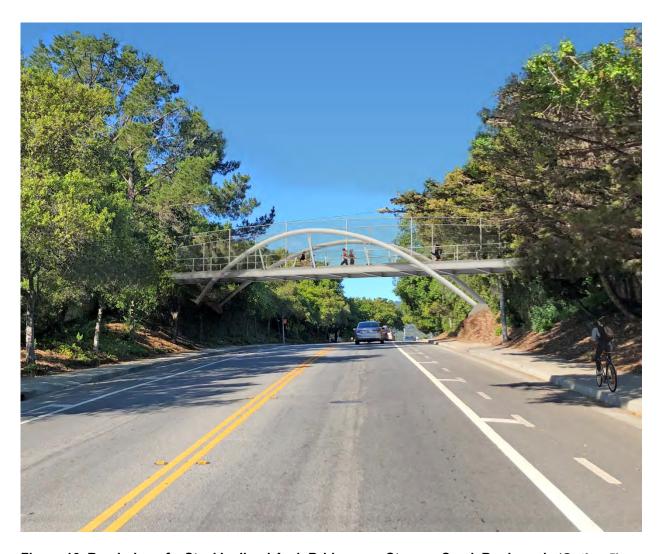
Rendering of a Steel Inclined Arch Bridge over Stevens Creek Boulevard. (Option 5)
